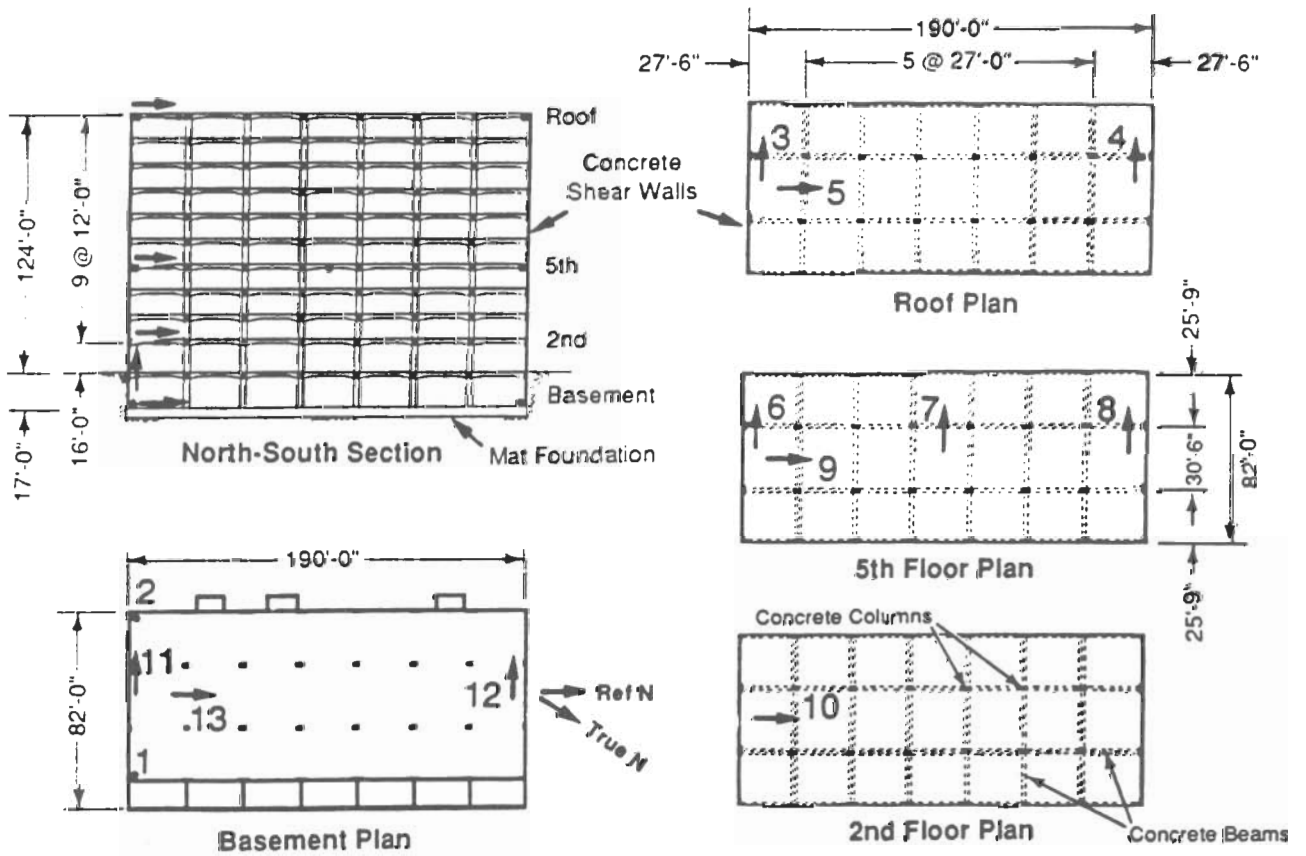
Building #1 - 10 Story Commercial Building, San Jose
